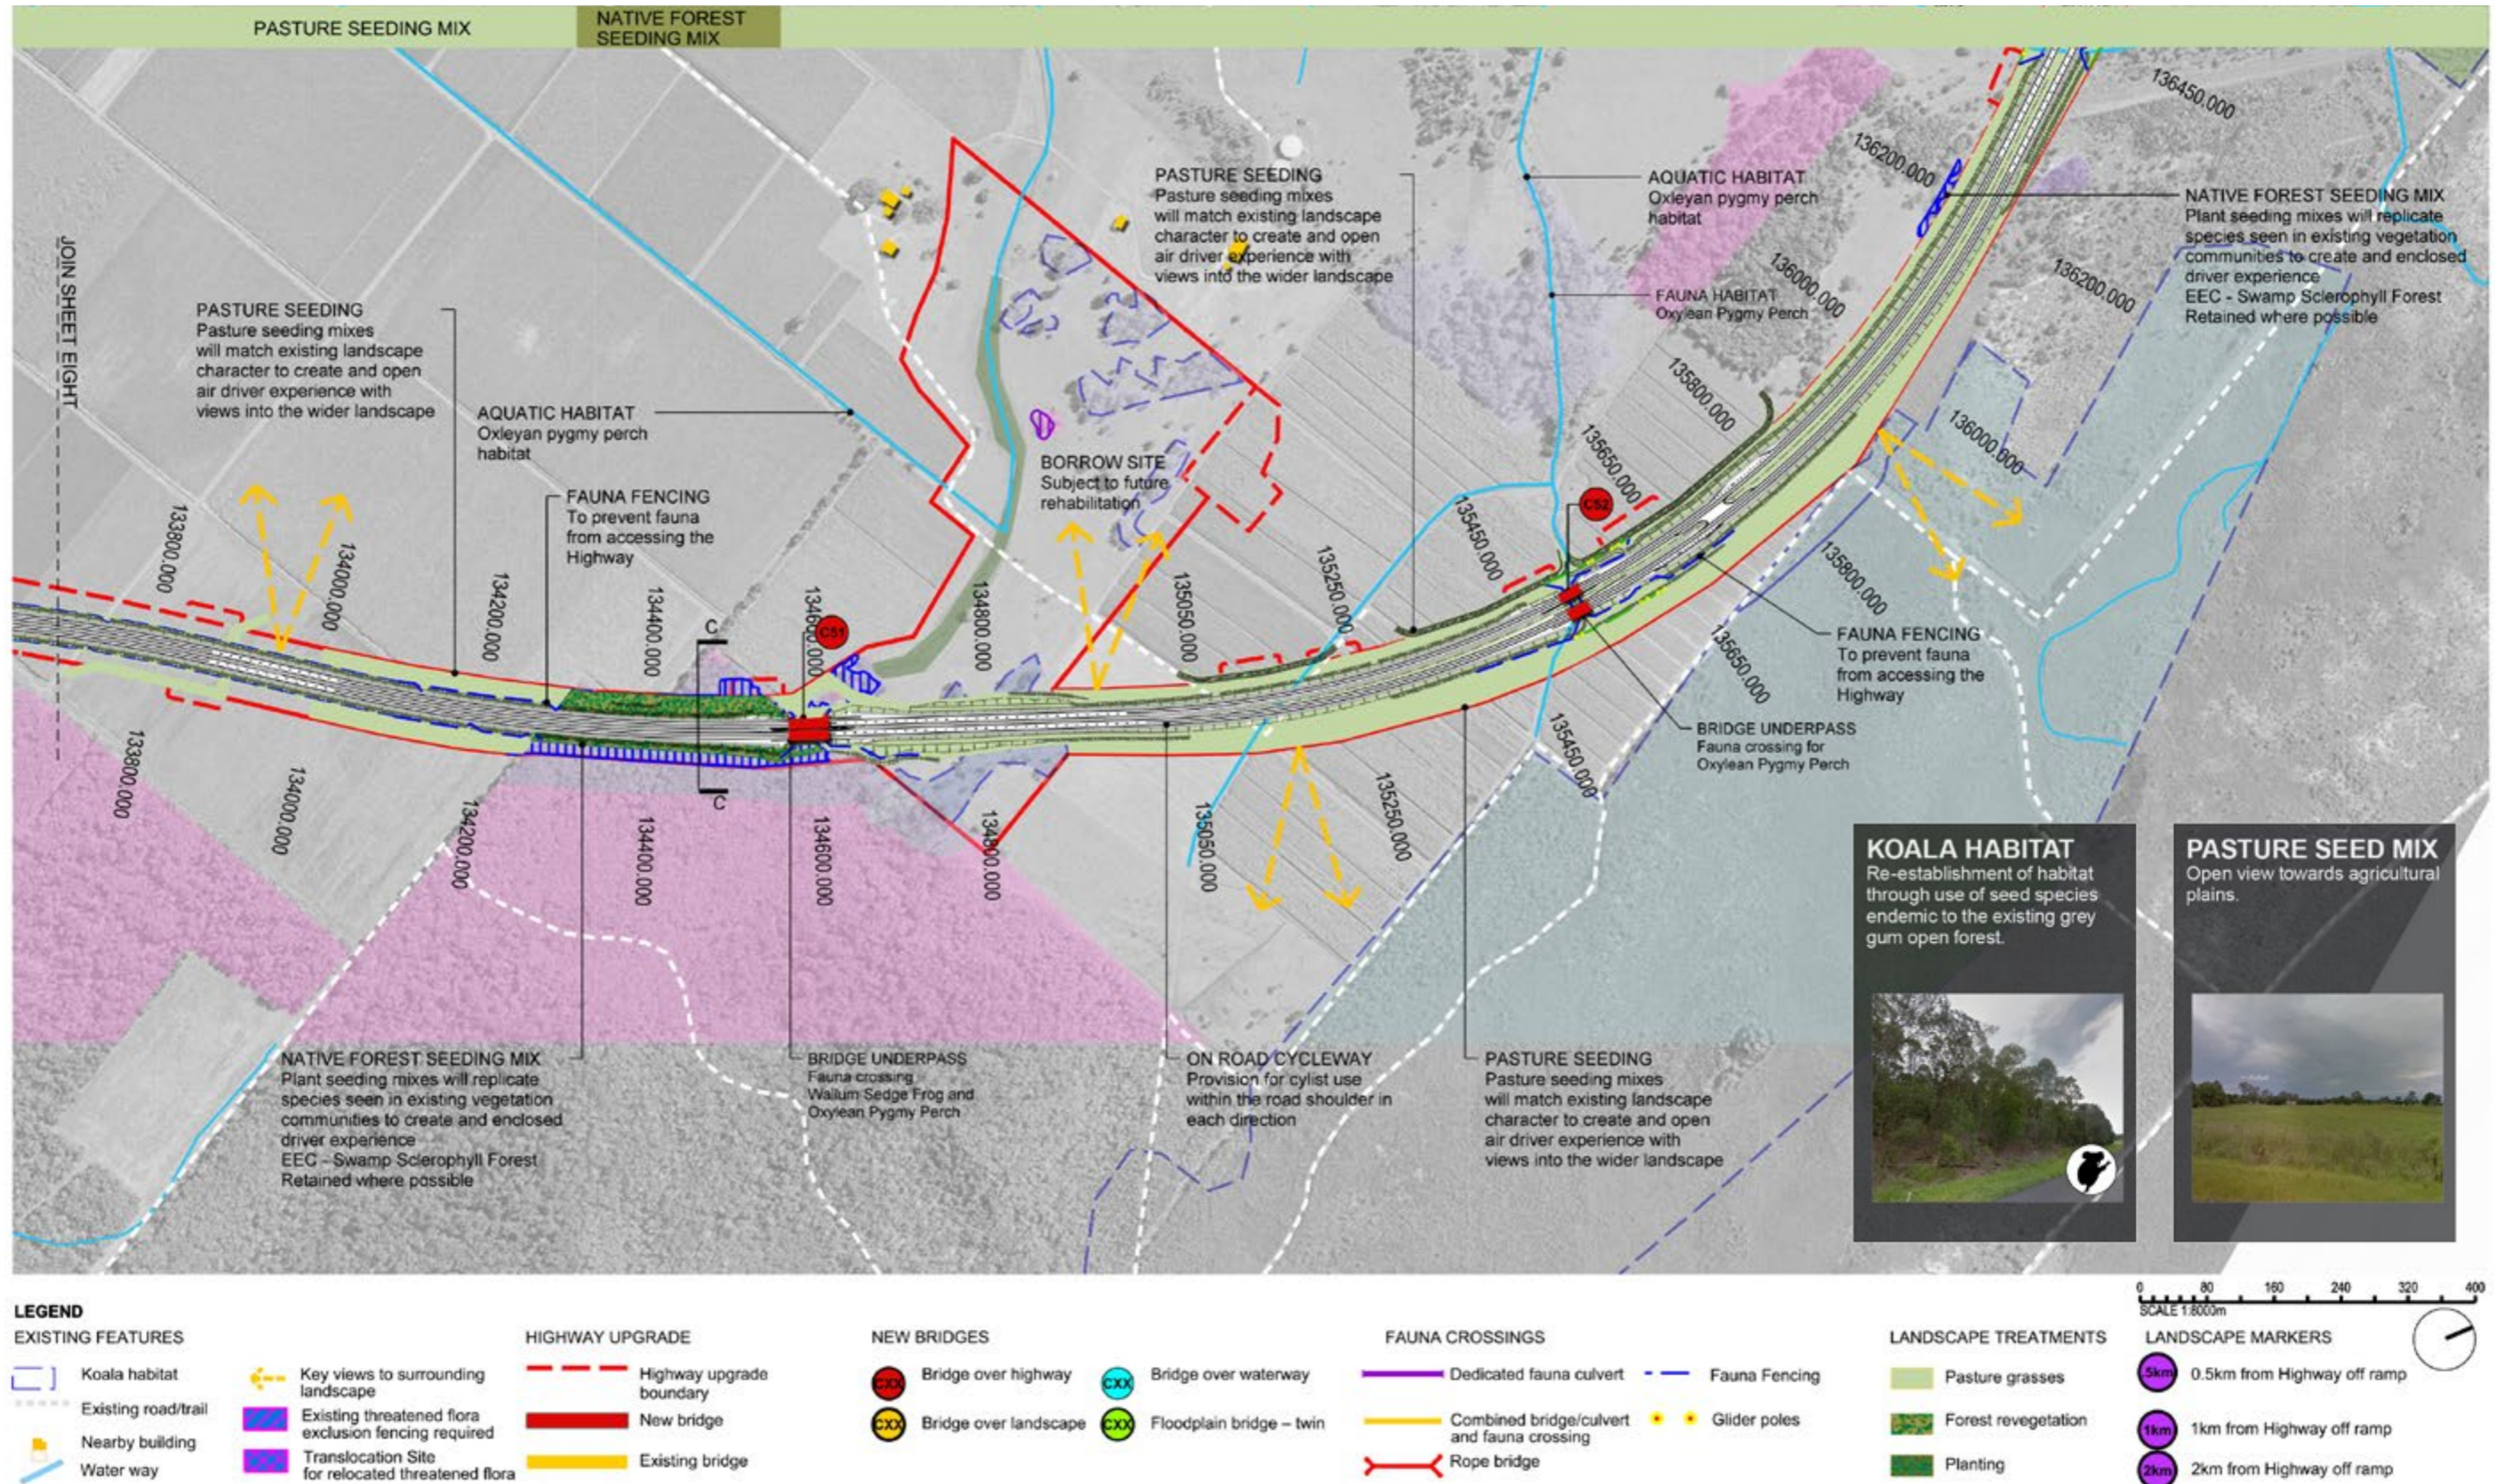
Urban and Landscape Design Strategy Plan – Trustrums Hill to Broadwater National Park – Sheet 9
